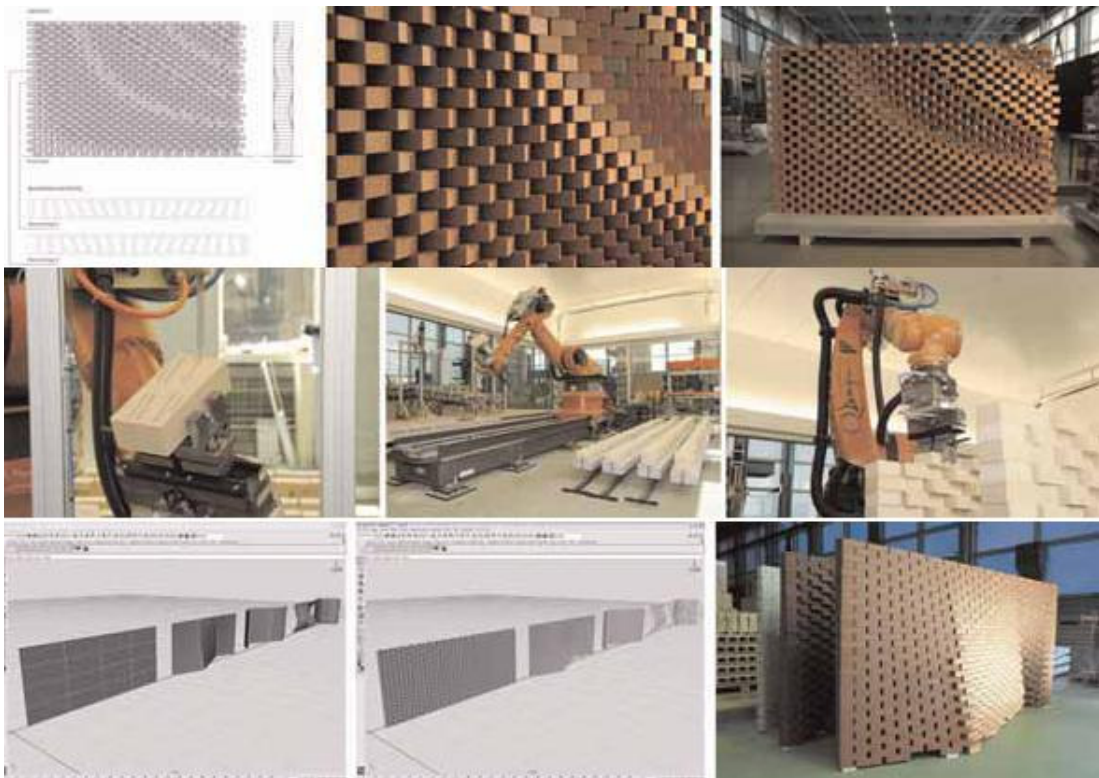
Prototypical application of digitally designing and fabricating non-standardised brick walls (Url-21)
